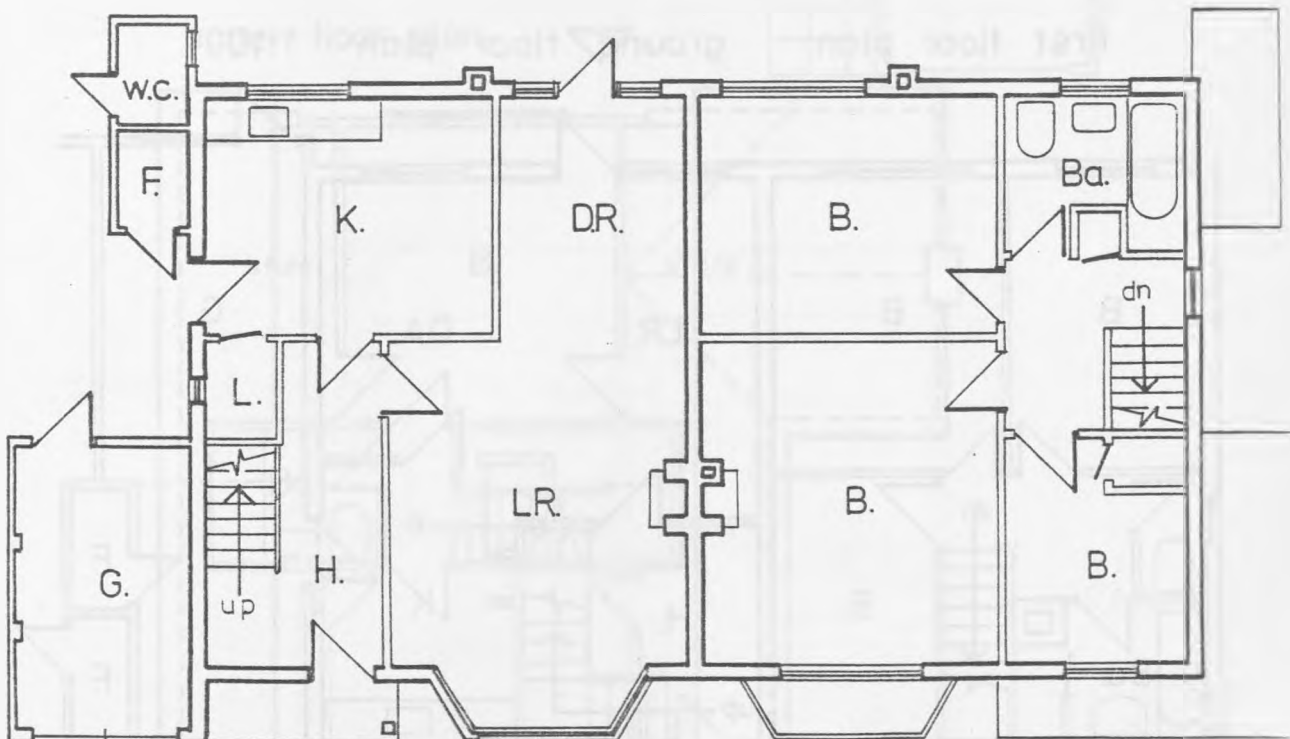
HOUSING AT TWICKENHAM 1957. A TERRACE HOUSE.
